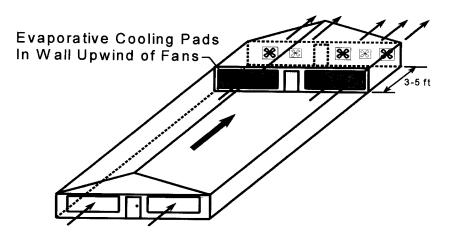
Evaporative cooling pad installed as a wet scrubber in a tunnel-ventilated swine building.
